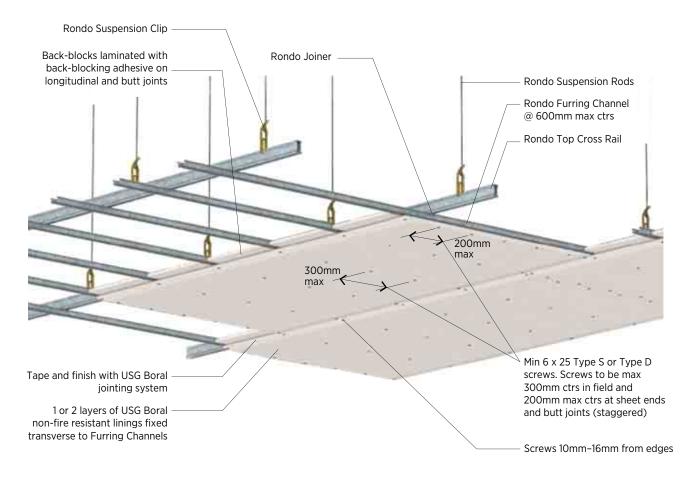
Non-Fire Rated Ceiling - Screw Fixing Layout
